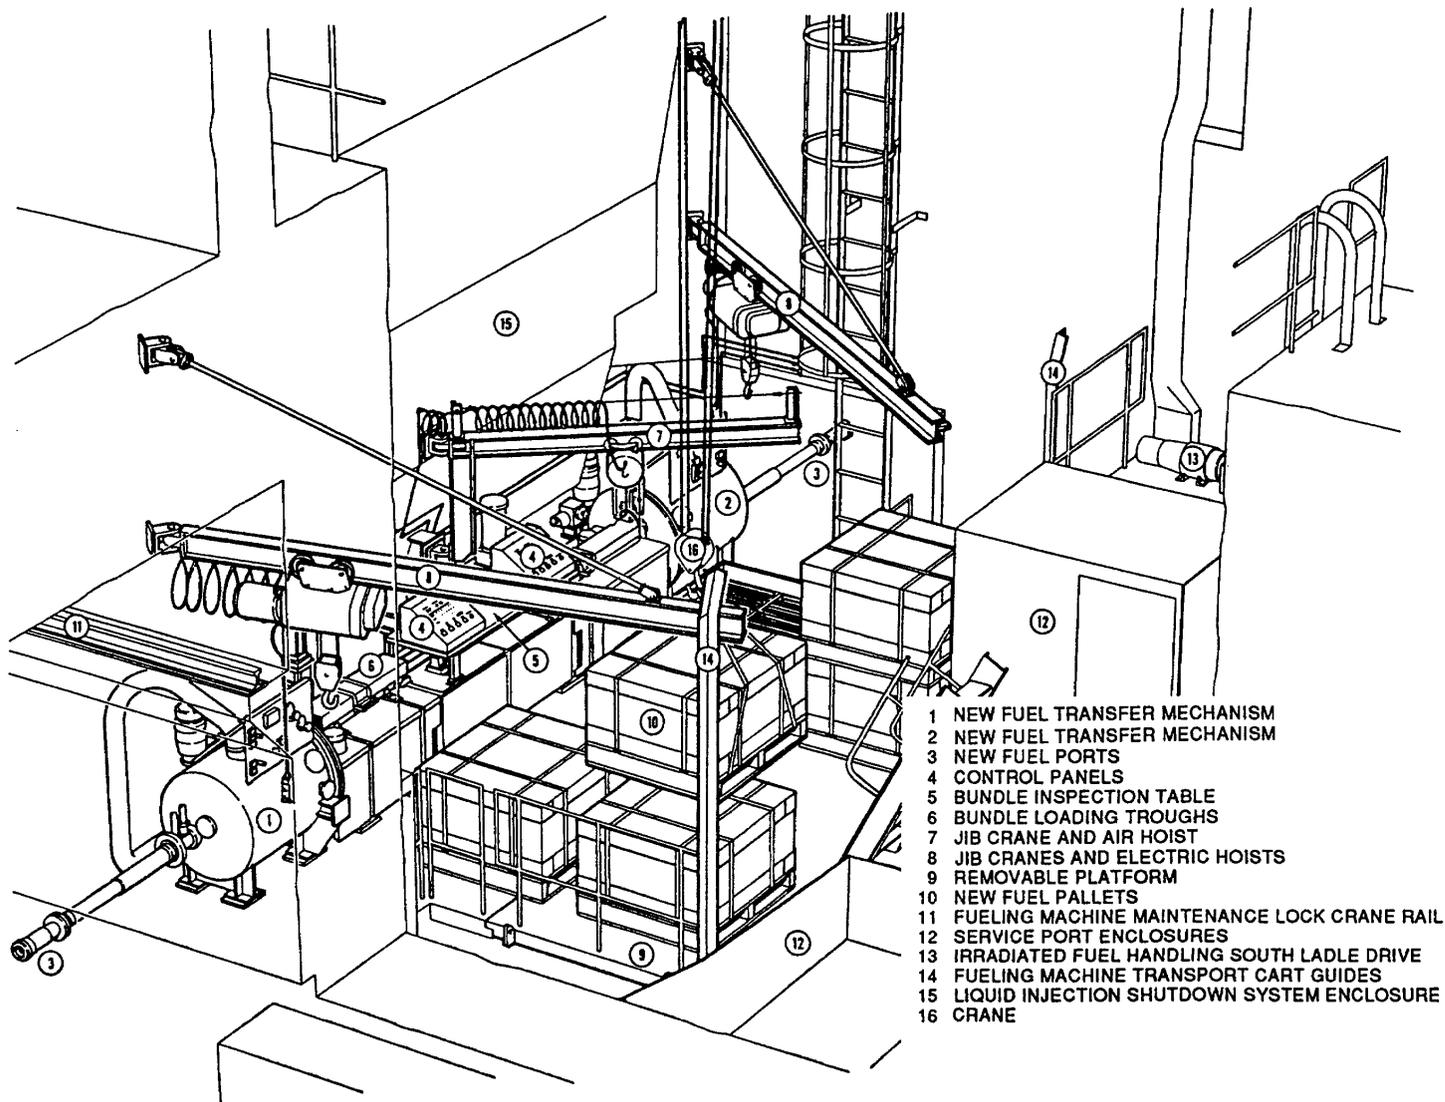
NEW FUEL ROOM EQUIPMENT
